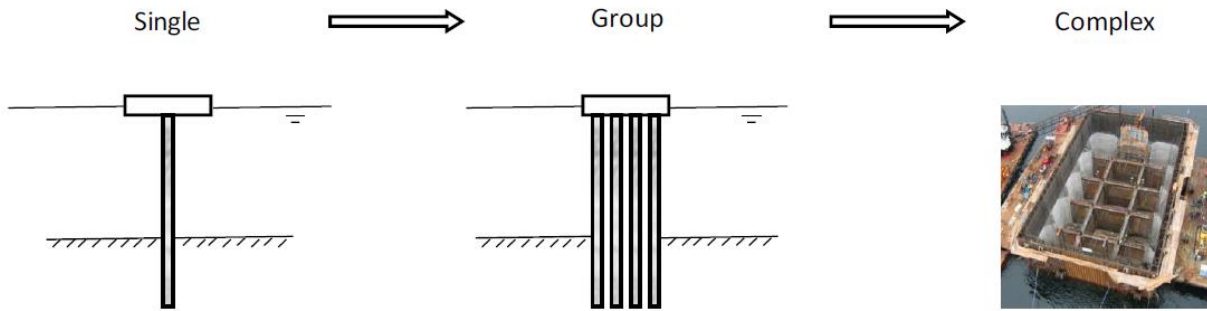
Single pile, pile group, and complex foundation example (Wang et al. 2017)
